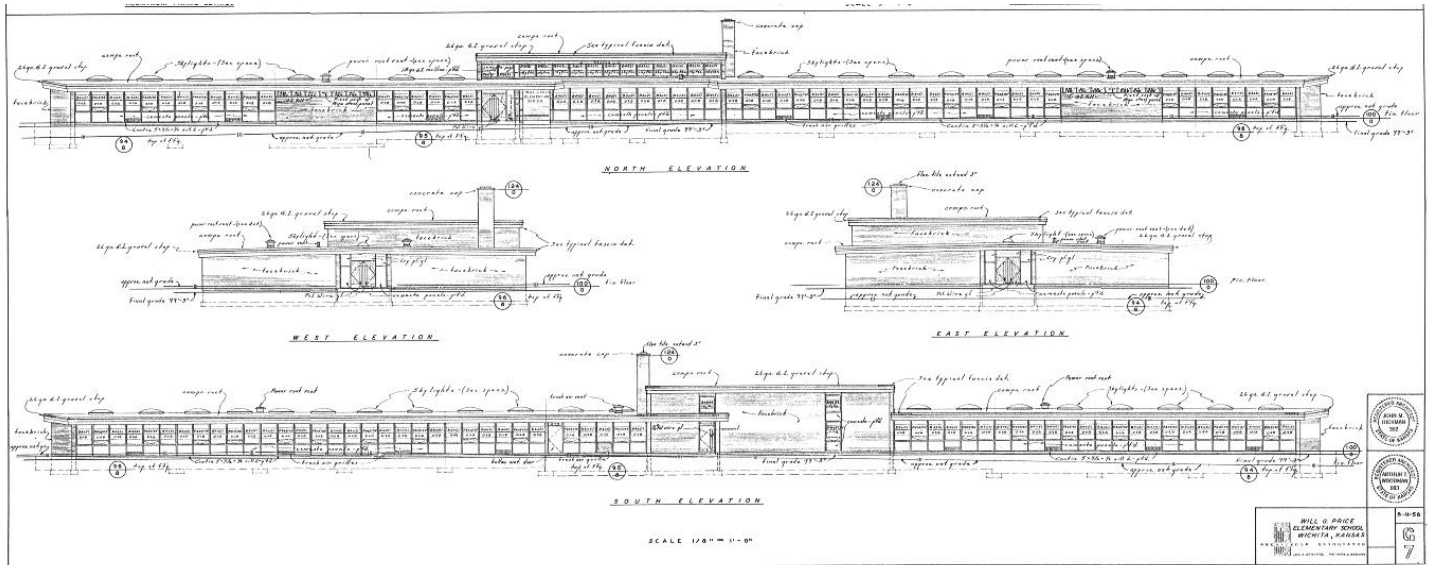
Elevations, Sheet G-7. Original design documents by Architects Associated (Hickman & Woodward), 8-14-1956, Provided by Wichita Public Schools.
